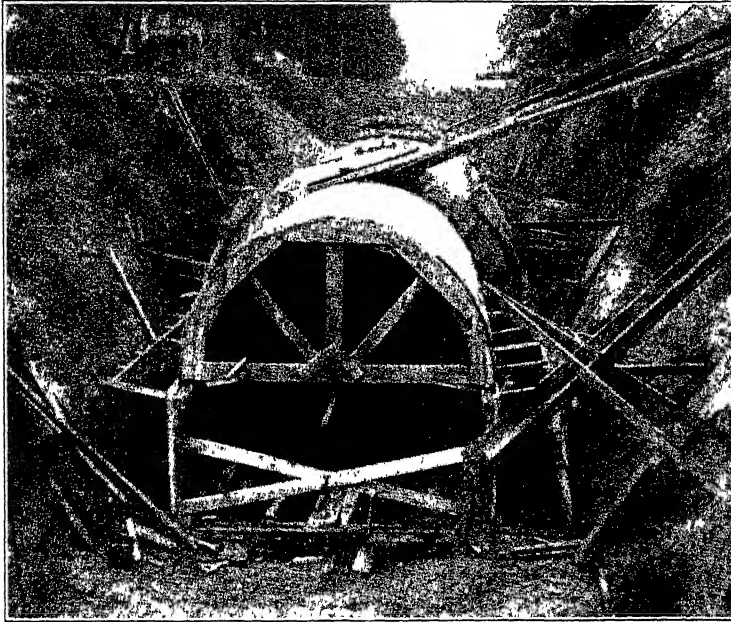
Construction of Dry-Run Concrete Sewer, Waterloo, Iowa.
